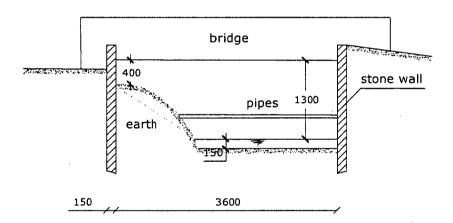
Cross-section of bridge over the Quebrada Bamboo (a in Figure 9)
